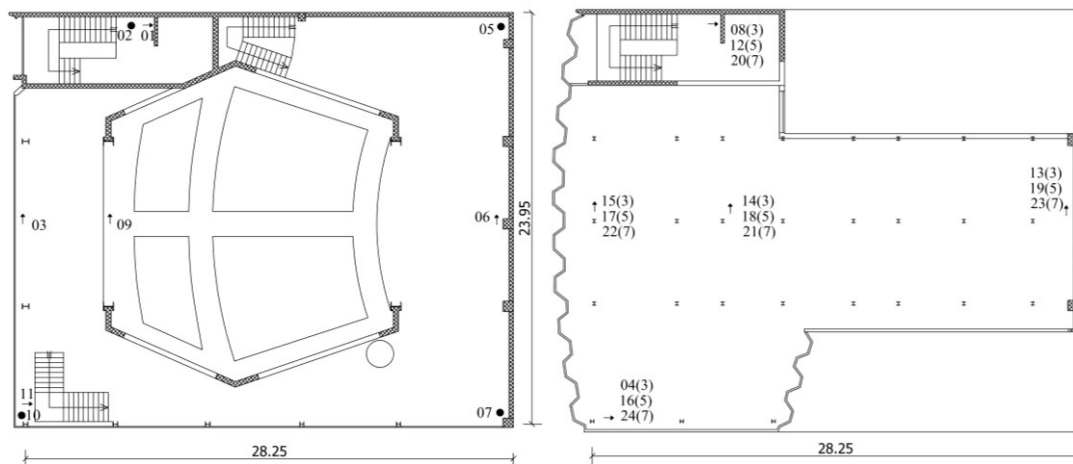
Sensor configuration on floor 0 (left) and on floors 3, 5 and 7 (right, numbers in () indicate the floor).
